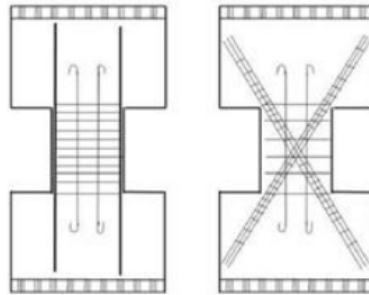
Typical Layout of diagonally Reinforced Coupling Beam [7].
